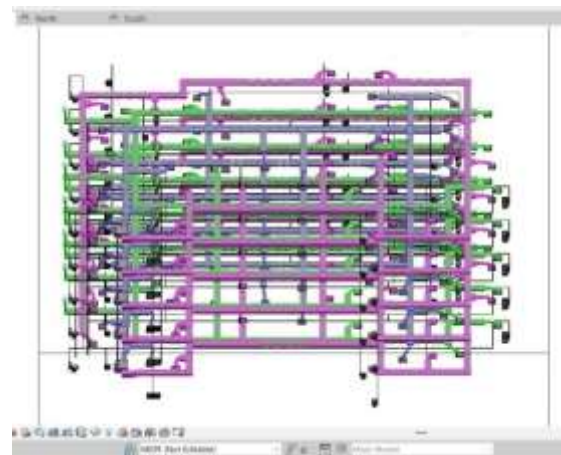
MEP pipe network- Elevation North of all 6 floors of overlaid disciplines.
